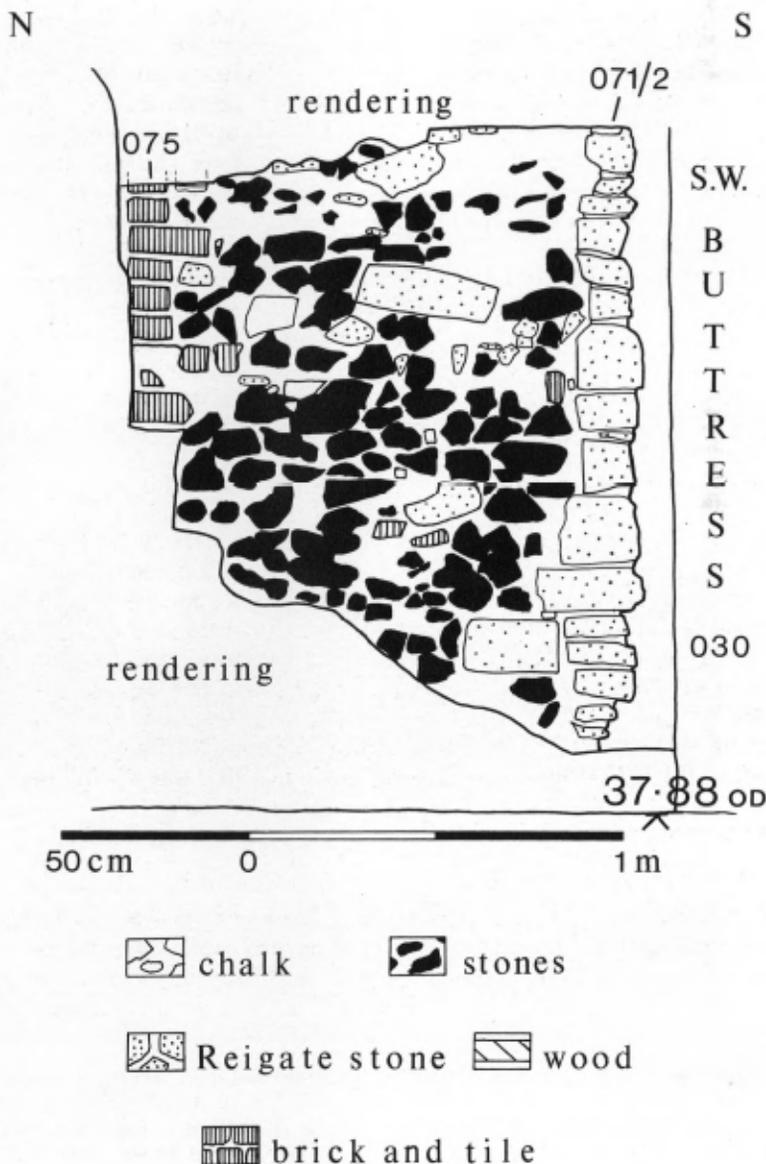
Carshalton Church: outer south aisle exterior, west wall, elevation. Key diagram refers also to figs 7, 8 and 11.
